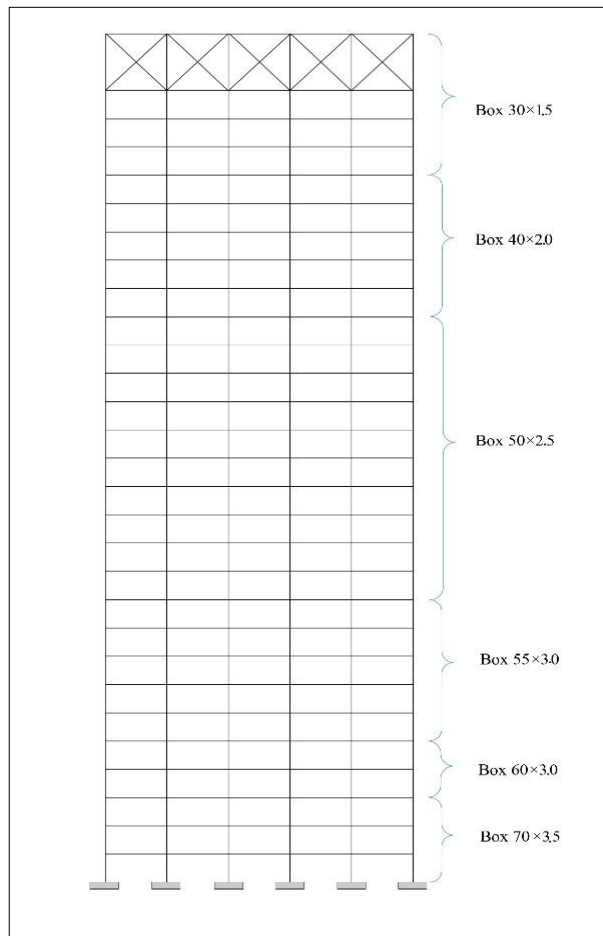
An exterior frame of tall building and the size of columns (dimensions in cm)
